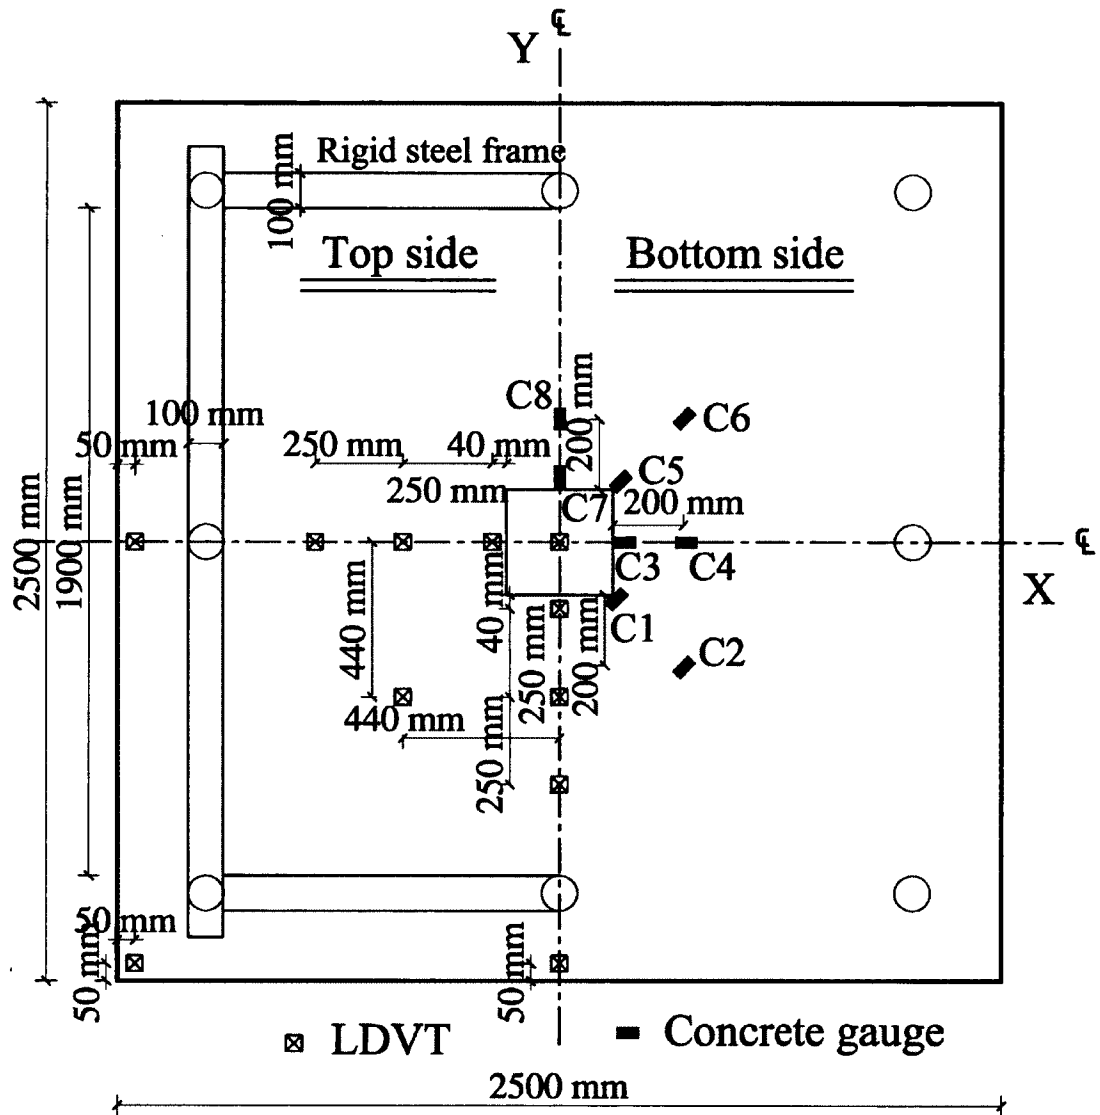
LVDTs and concrete gauges placing in the top and bottom sides
